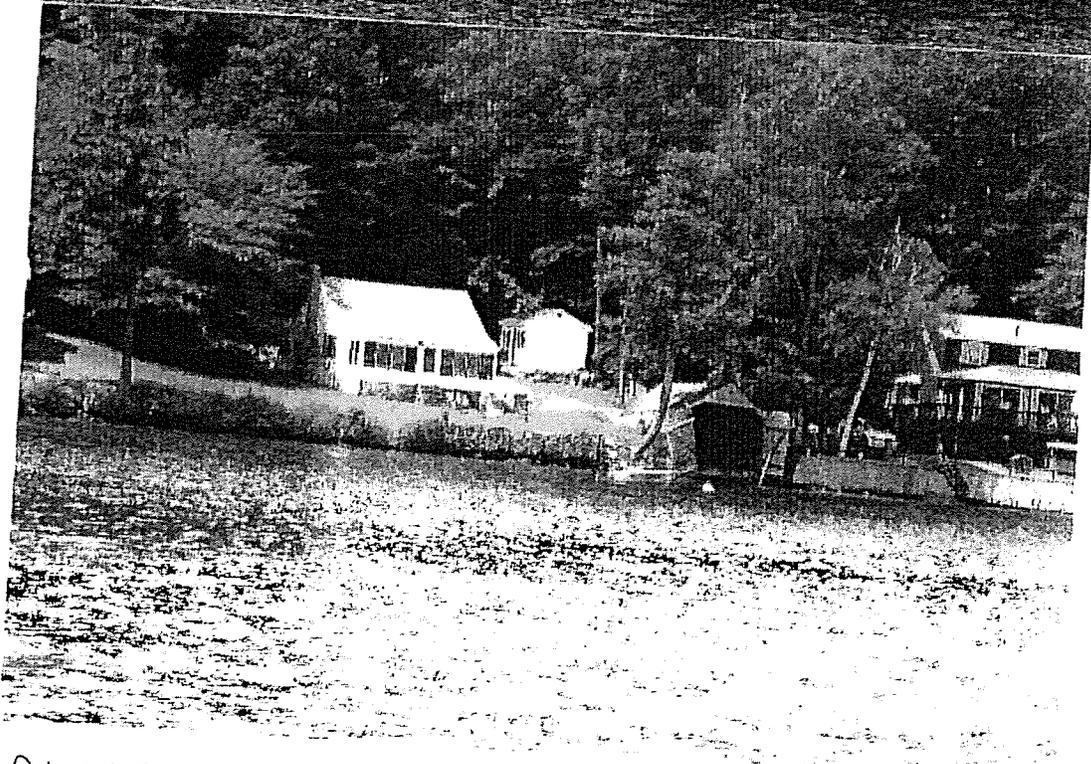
LOOKING NORTH TOWARDS COLLAPSED STRUCTURE 11-9-15
